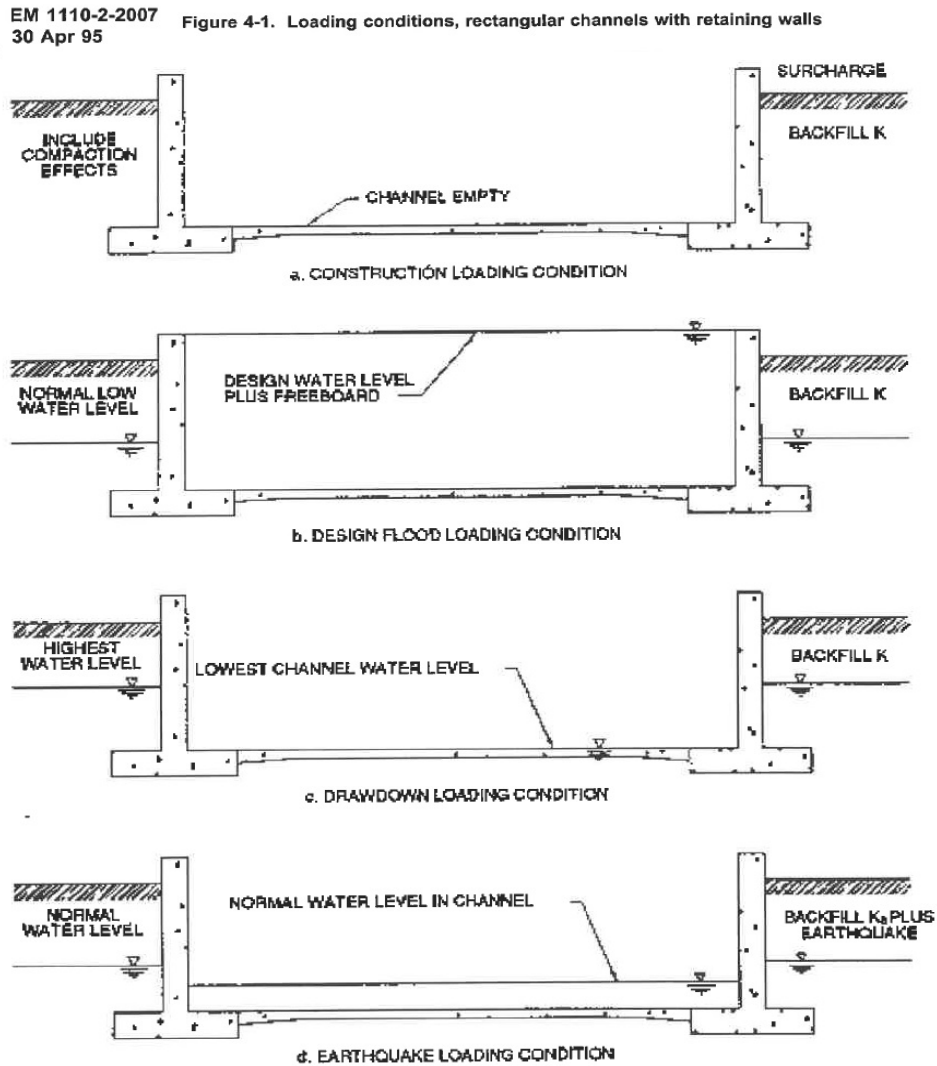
Loading Conditions for Rectangular Channels with Retaining Walls (USACE, EM 1110-2-2007, Figure 4-1)
